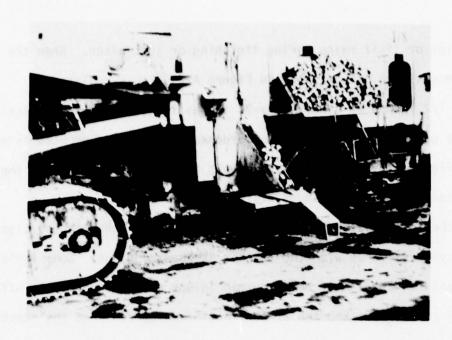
View of Paver Showing a Supply of Wiggle Bolt Ties and the Hydrualic Ram Used in Installation into the Plastic Concrete, Detroit.
